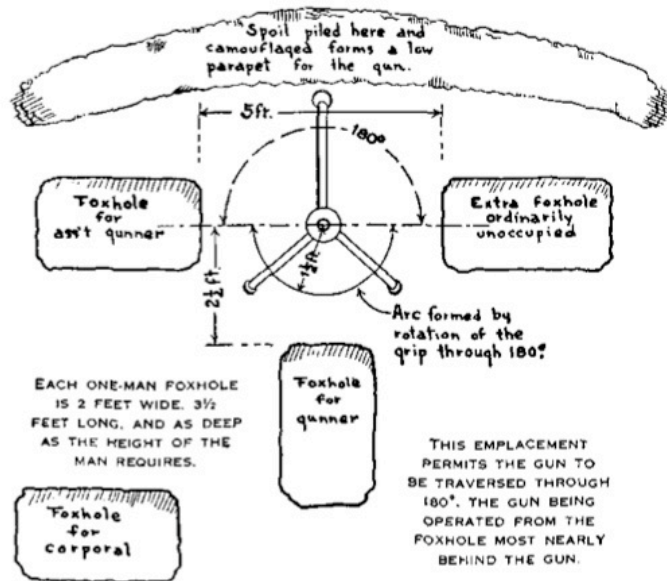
Heavy machine-gun emplacement, with standing type one-man foxholes for crew.
